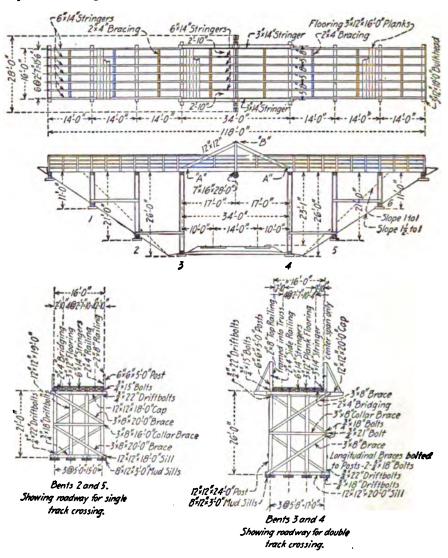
HIGHWAY CROSSING. ILLINOIS CENTRAL RAILROAD.
